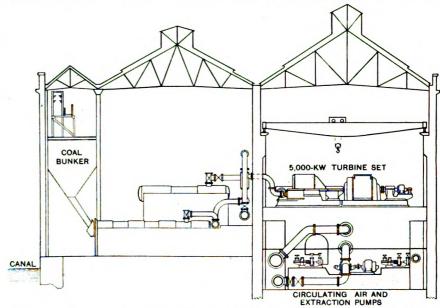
Sectional Elevation, showing Abrangement of 5,000-kw. Turbine Set, with Condensing Plant, &c.
